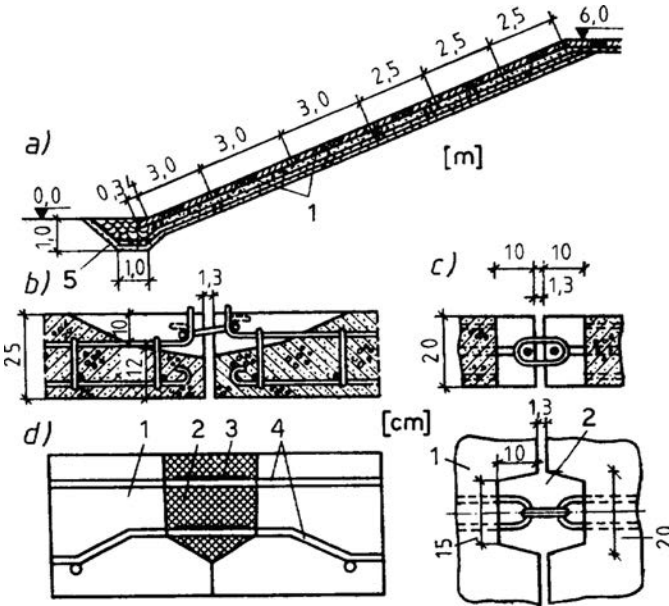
Protective construction with prefabricated reinforced concrete slabs. (a) Section through construction; (b) hinge connection of slabs; (c) connecting of the slabs with special dowel reinforcing bars; (d) concreting of joints of small slabs. (1) Slabs; (2) joint infilling with asphalt mass; (3) weld; (4) steel reinforcement; (5) retaining prism.
